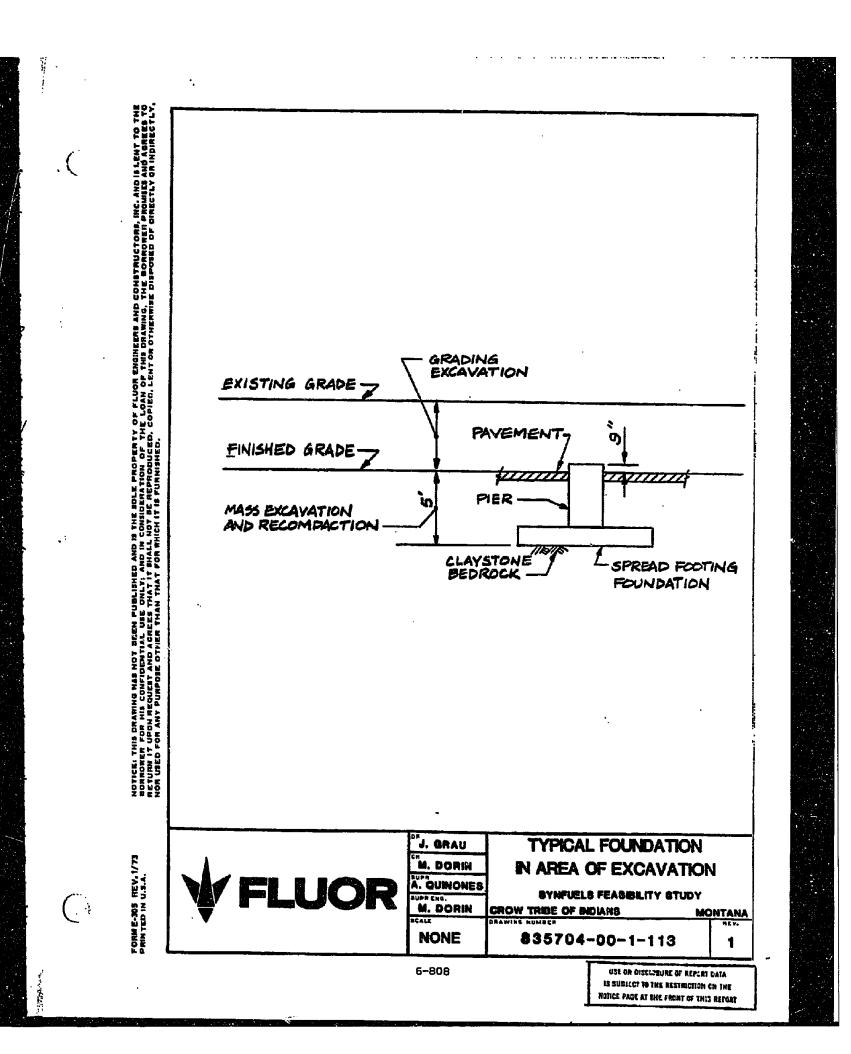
shows the typical foundation in an area of excavation. The area is graded by excavating to finished grade. The area is also mass excavated an additional 5 feet, the foundation is placed, and then the 5 feet layer is backfilled and recompacted. The foundation rests on claystone bedrock.
